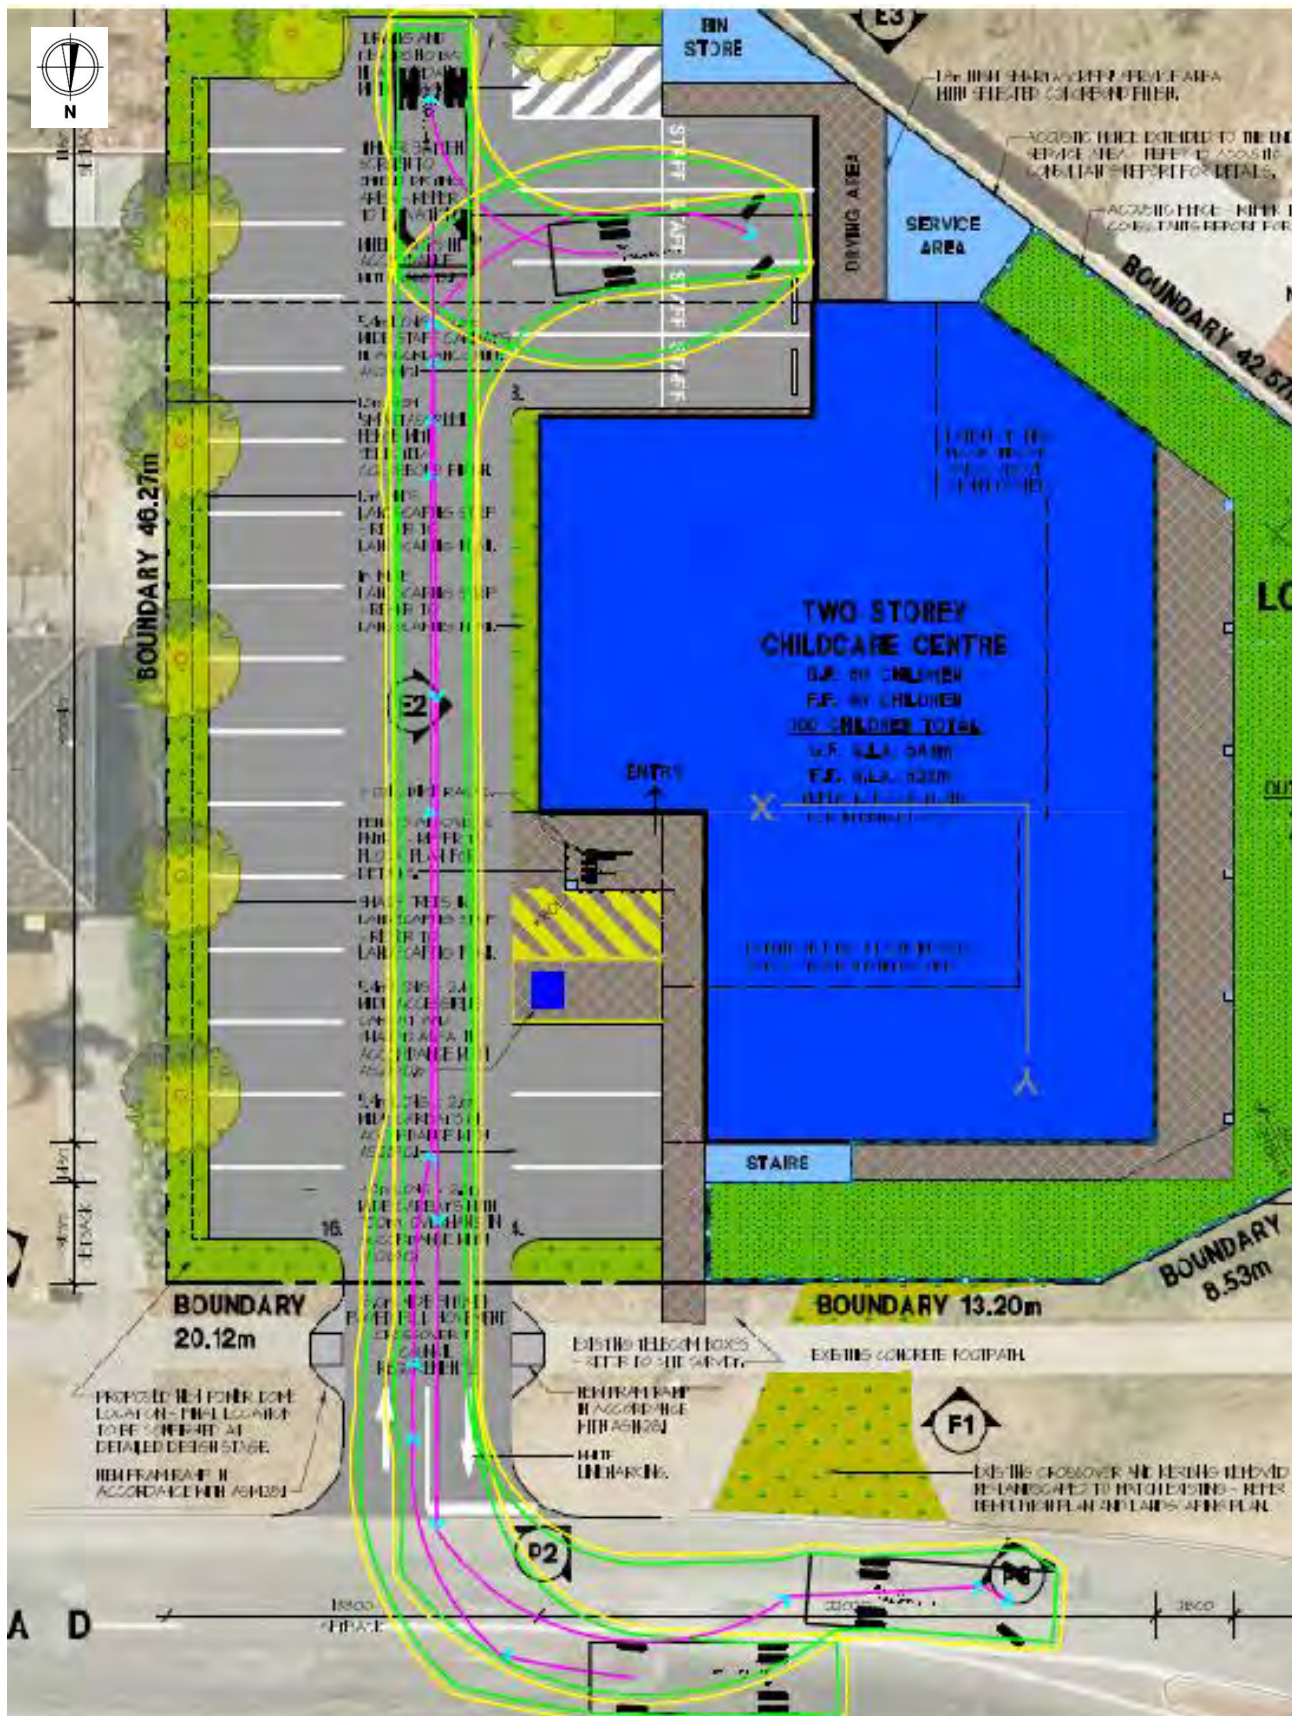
Swept path analysis for an 8.8m long waste collection vehicle accessing the proposed Shoalwater Childcare Centre site (base plan source: Hindley and Associates Building Designers, 2022)
